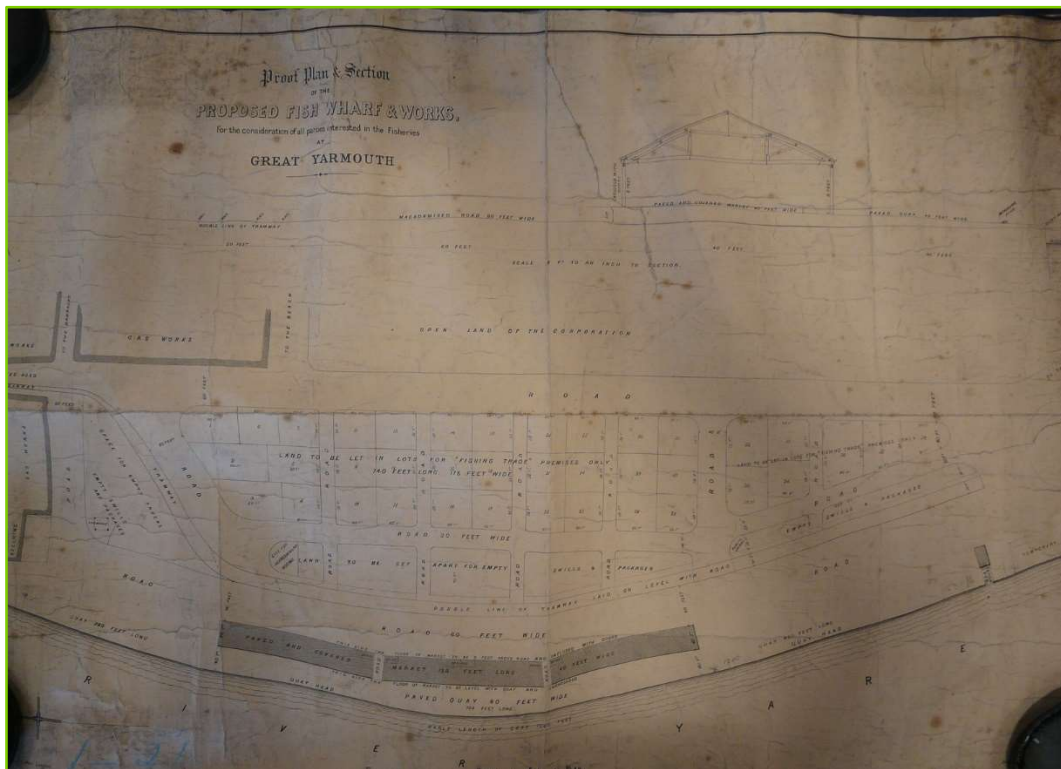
Proof Plan and Section of the Proposed Fish Wharf and Works 1866
